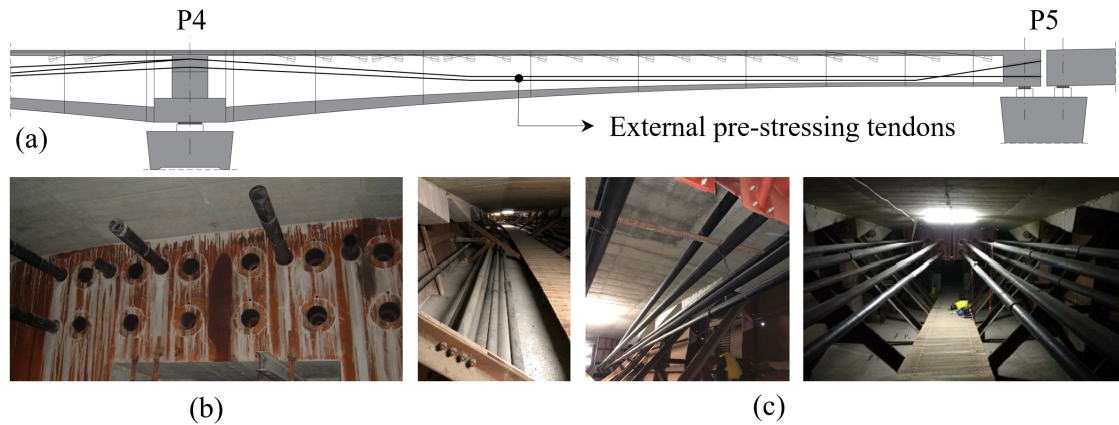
External pre-stressing tendons layout. (a) External pre-stressing drawings; (b) picture of one anchorage of external tendons; (c) external tendons positioning inside the bridge.
